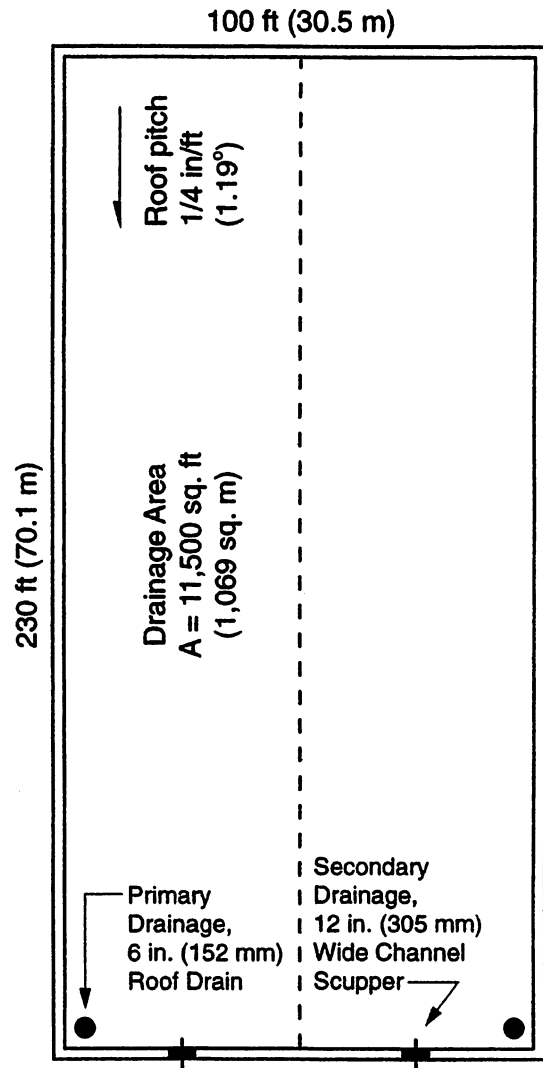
EXAMPLE 2 ROOF PLAN
